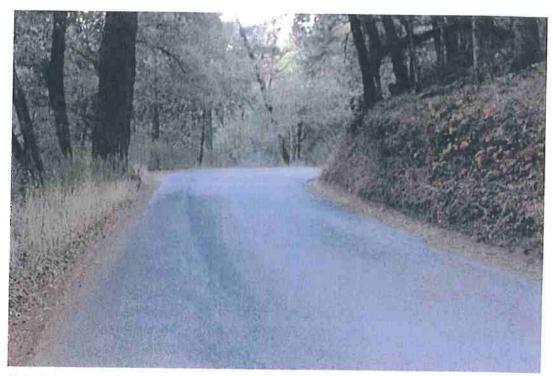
Mile 1.0: Pinch point at tree on blind corner; 15-ft road width with 1-ft shoulder. Recommend widening.
